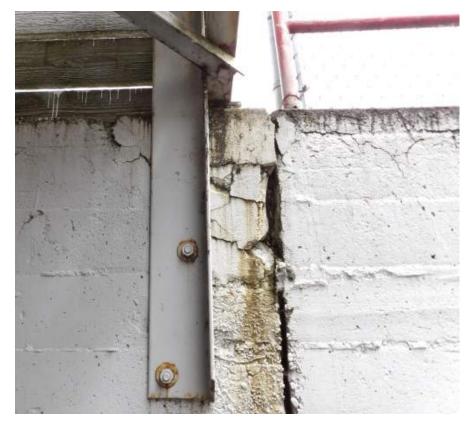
E: CRACKING AND SPALLING AT TOP OF CONCRETE WALL
